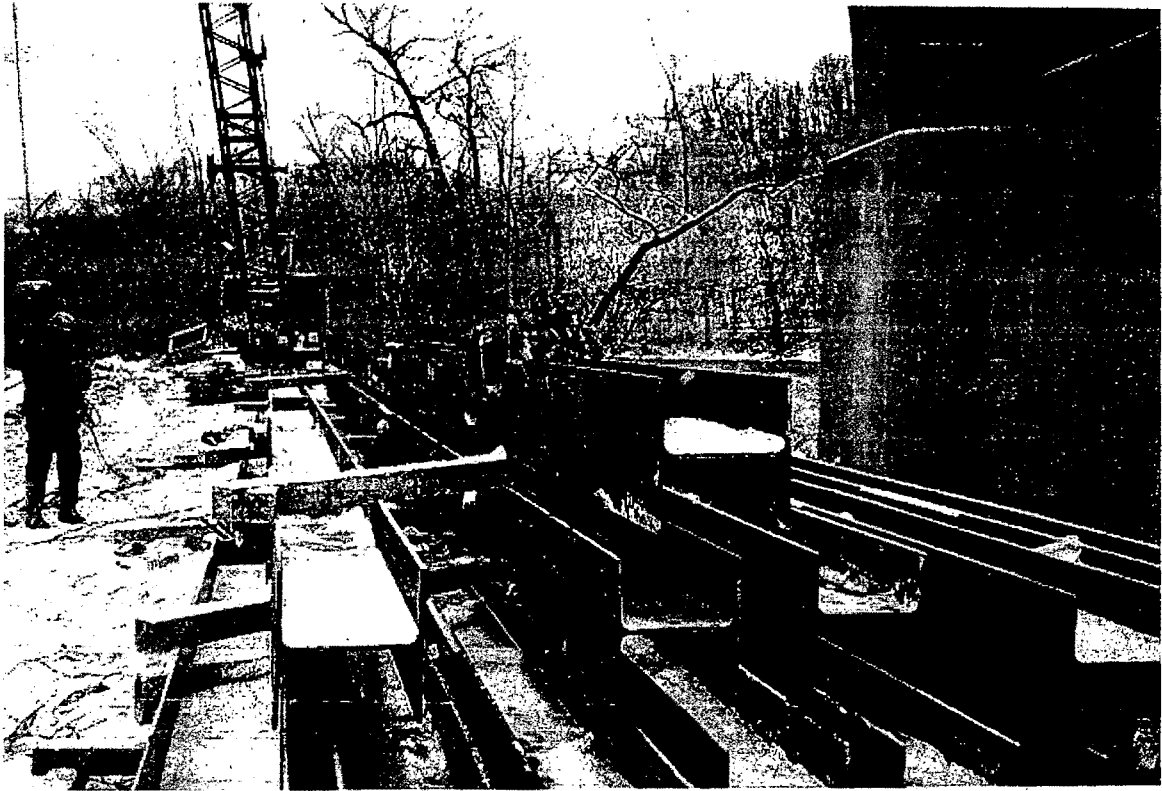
Soldier pile instrumented and ready to be moved to the hole.
